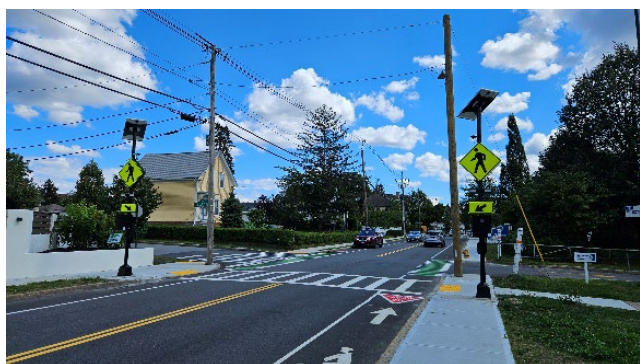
New bike lane and RRFBs at a crosswalk on Burncoat Street.
